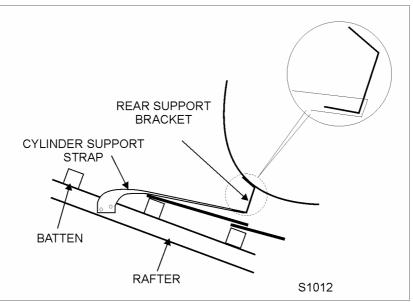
Cylinder Support Strap Location (Roof Pitch < 30 Degrees)
